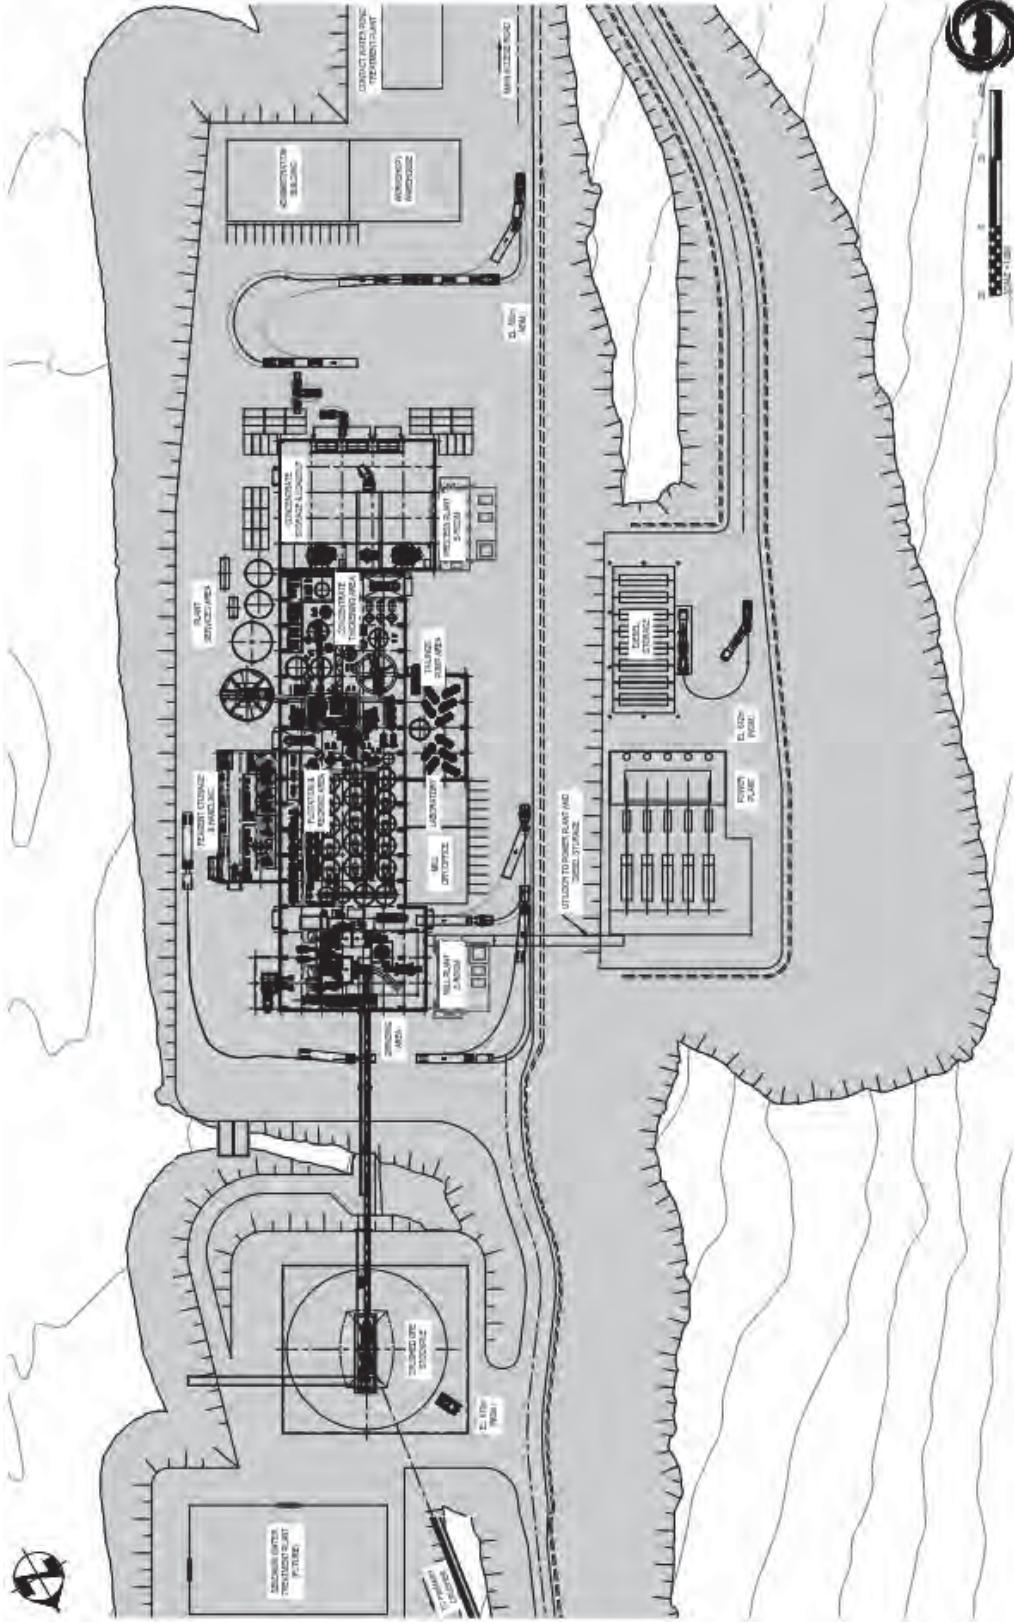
Proposed Location of the Processing Plant and Other Buildings (Ausenco, 2020)
